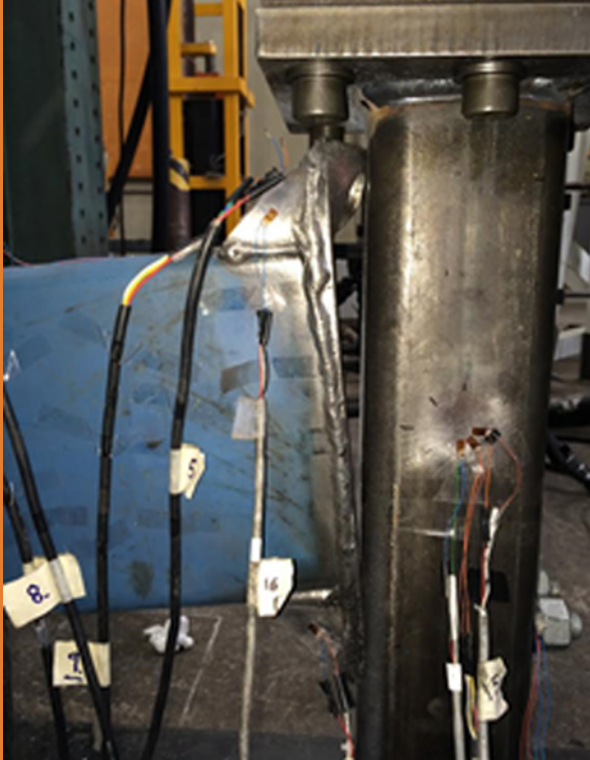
Side view showing plate yielding and bolt fracture
